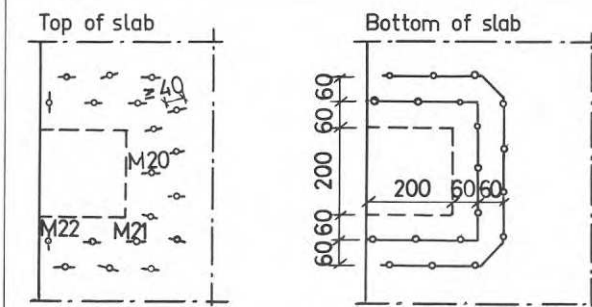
Shear reinforcement of Test Slabs Nos. 4 and 6. M20 to M22 are the shear reinforcing bars which were used for strain measurements. The shear reinforcement in Test Slabs No. 5 and Nos. 7 to 9 was placed at the same distance from the column.
